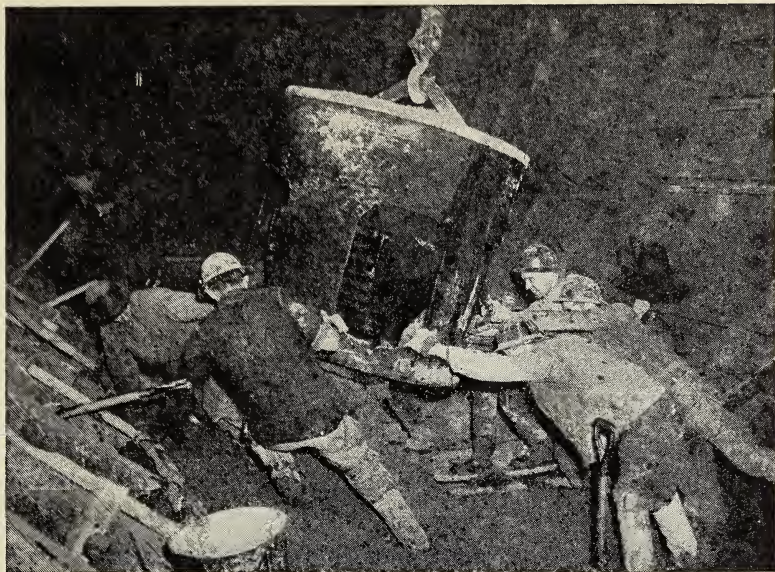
In tunnel construction, "sand hogs" may work 100 feet below sea level, under air pressures much higher than normal. (*Courtesy New York City Tunnel Authority*)
